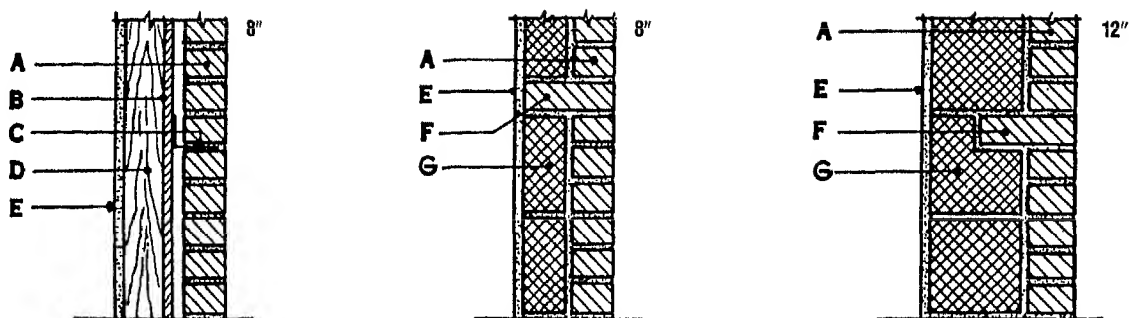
Faced or veneered construction; bearing (sections). A=brick; B=sheathing; C=corrosion-resistant metal ties spaced 24 in on centers, vertically and horizontally; D=wood or steel studs; E=plaster or gypsum wallboard; F=masonry bond; G=masonry backing unit.
